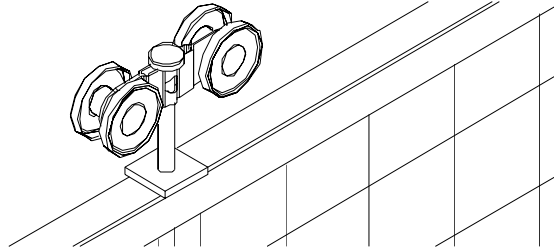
SLIDING DOOR - TROLLEY ASSEMBLY
